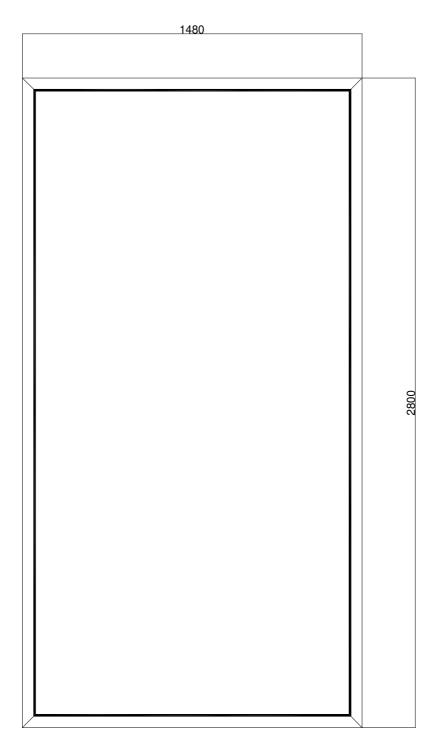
Top view of the received and tested sample (declared nominal dimensions, expressed in mm)
